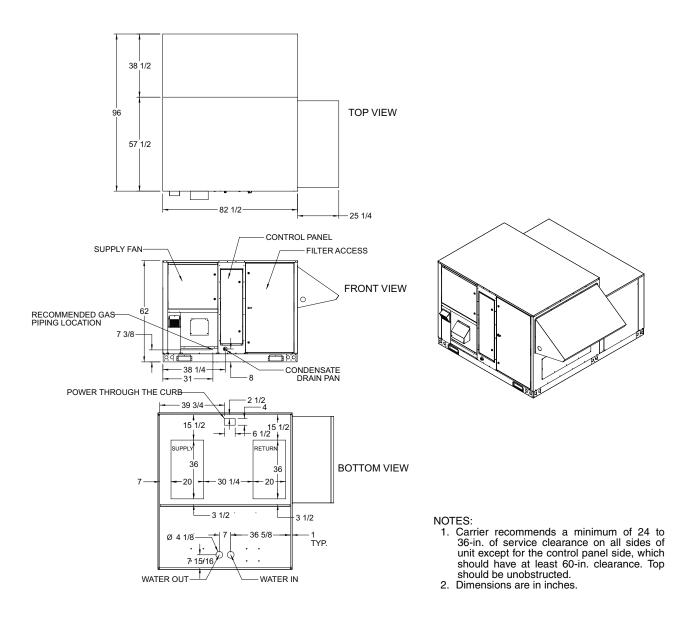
Unit Dimensions — 62RA, RB07-09 Standard Units
